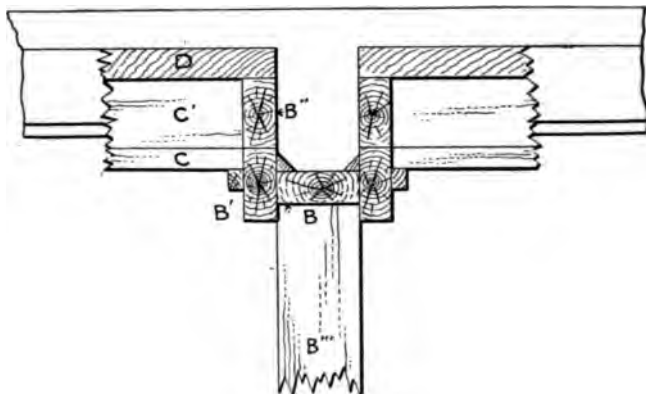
Hennebique Form for Slab and Girder Floors.
